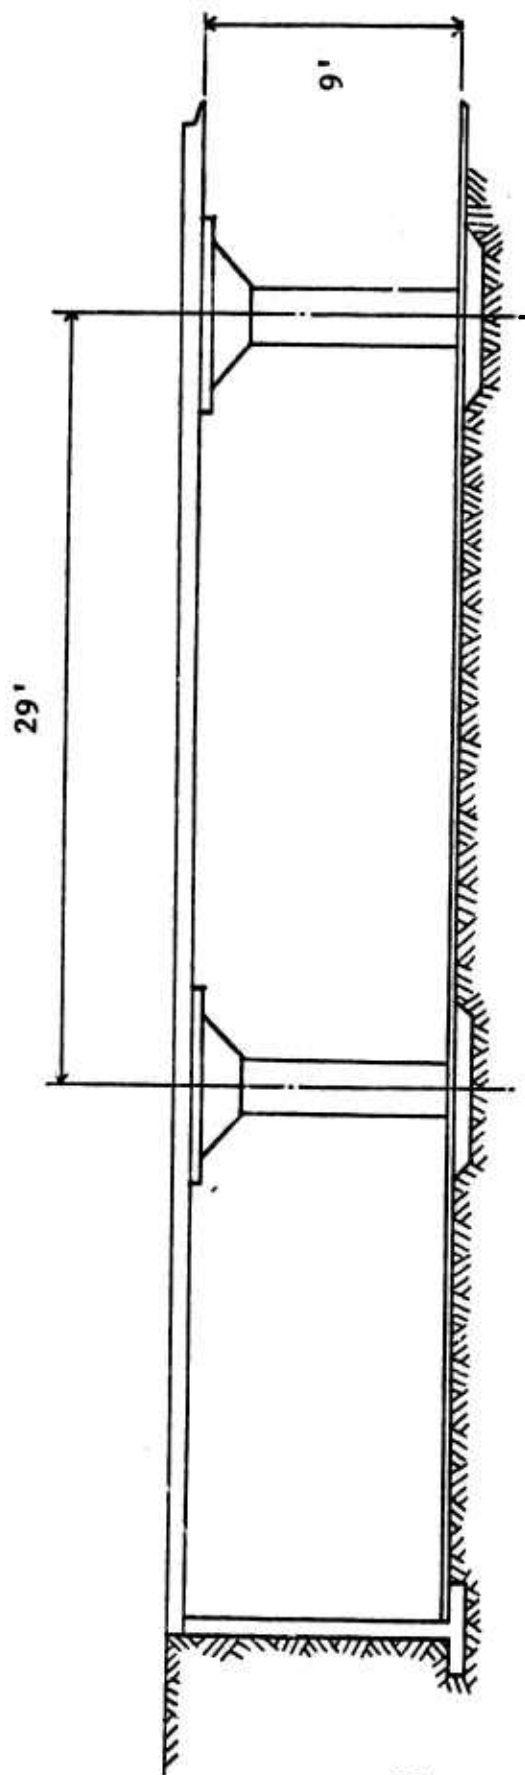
SECTION THROUGH TYPICAL PARKING GARAGE SHELTER
